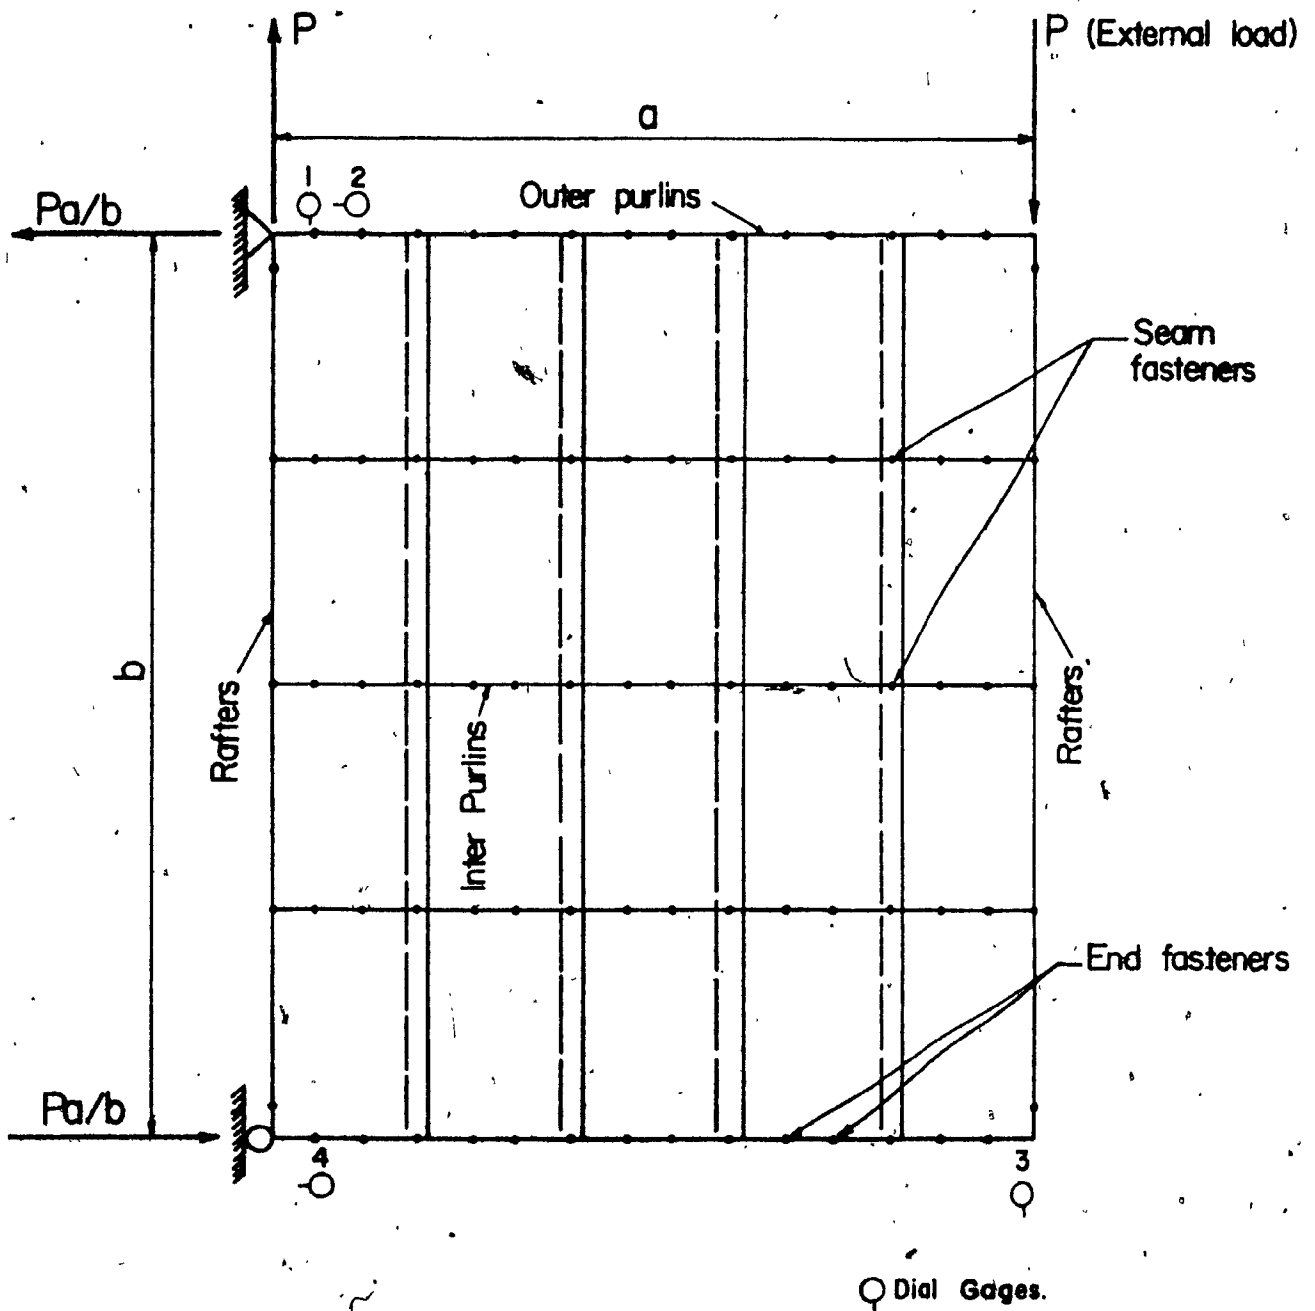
Arrangement of Panels in Typical Shear Diaphragm.
